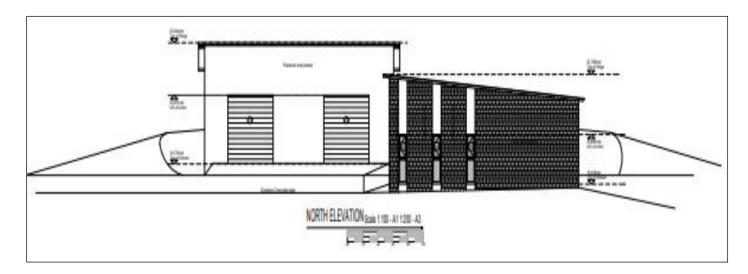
North elevation of the proposed new garages (TMBA, 2023)
